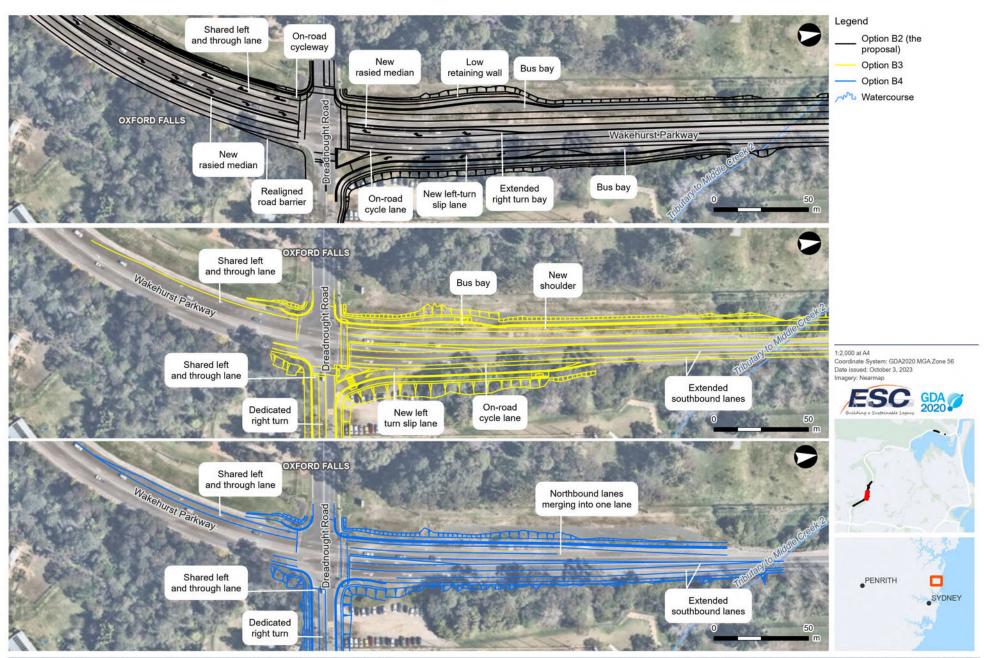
, Wakehurst Parkway and Dreadnought Road intersection - Options B2 to B4
